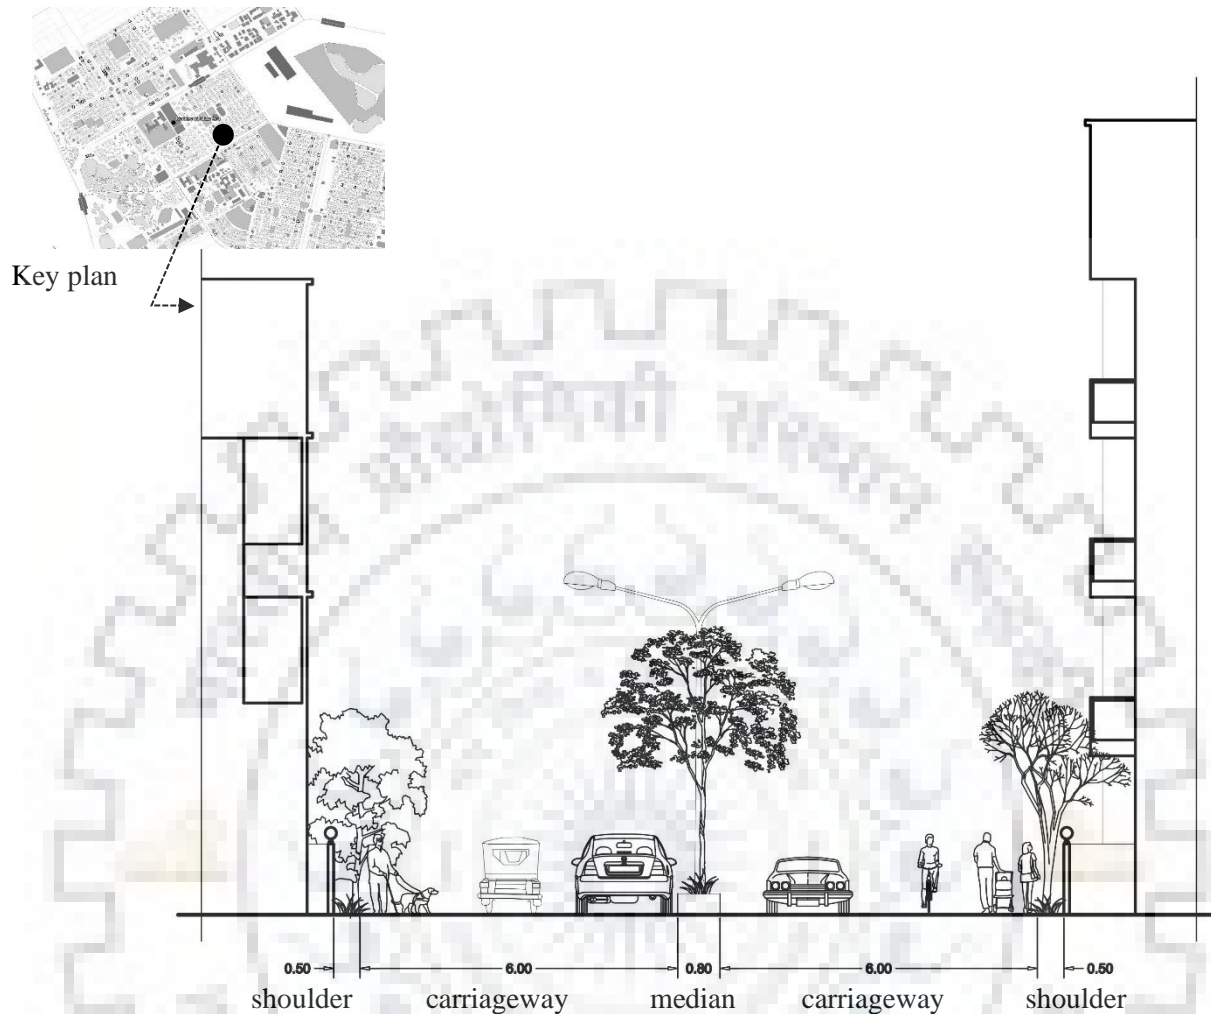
Street section of 1A cross road, Salt Lake Sector 1
